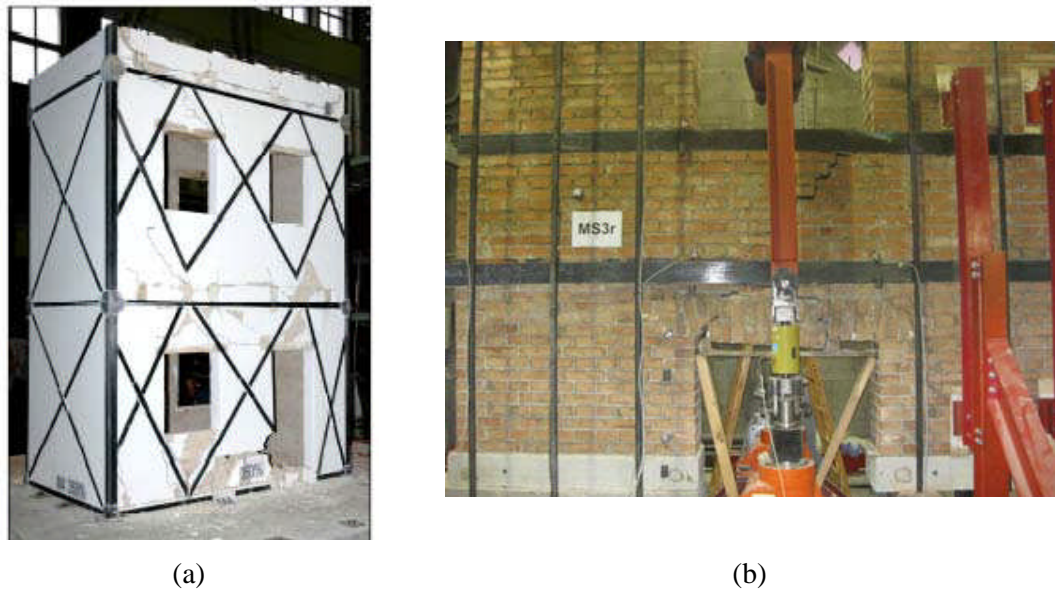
Examples of application of CFRP strips: (a) building model tested at the ZAG laboratory, (b) masonry spandrel beam tested at the University of Trieste.
